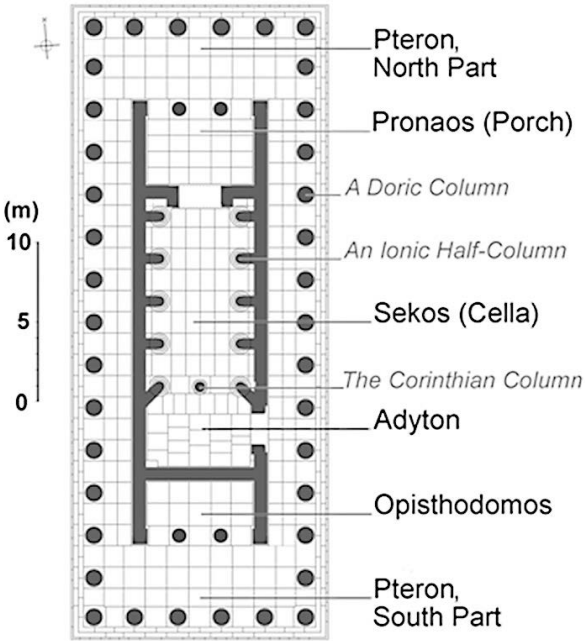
Plan of the Temple of Apollo at Bassai, noting spaces and distinctive architectural features.
